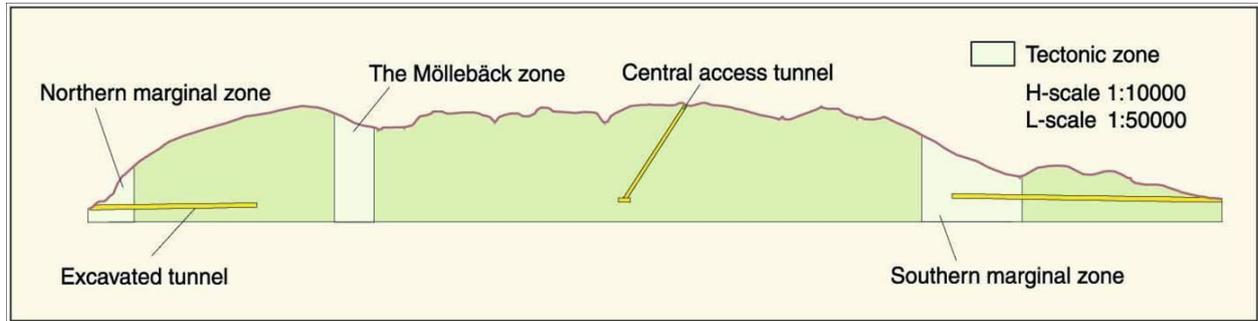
Schematic geological profile of the Hallandsås ridge with in 1997 already excavated tunnel sections
